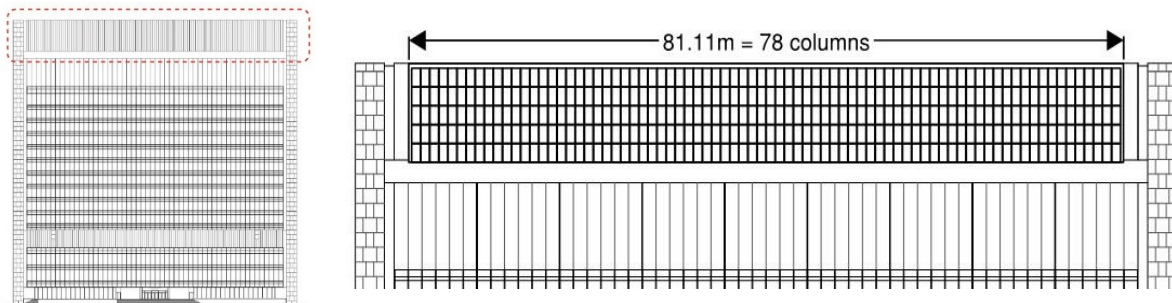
South elevation with penthouse area in red box (left) and suggested module layout (right)
